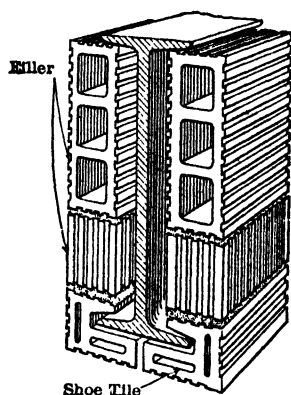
Showing application to Larger Girders Using More than One Piece for Filler
